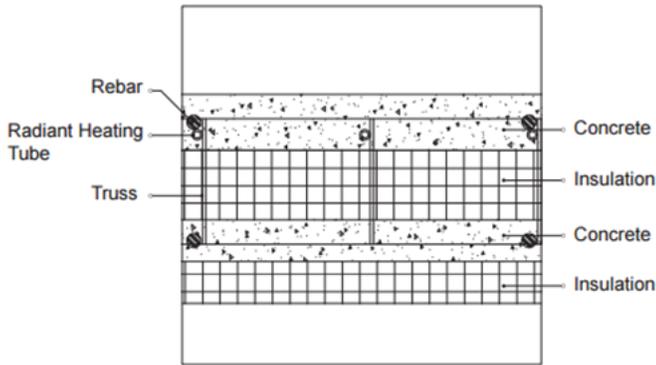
SECTION VIEW OF FLOOR PANEL WITH RADIANT HEATING TUBES
